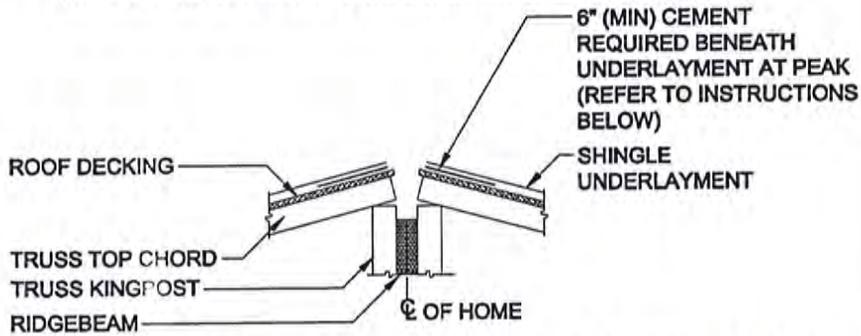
Roof connection- Alternate #2 must be used with Ridge Vents
